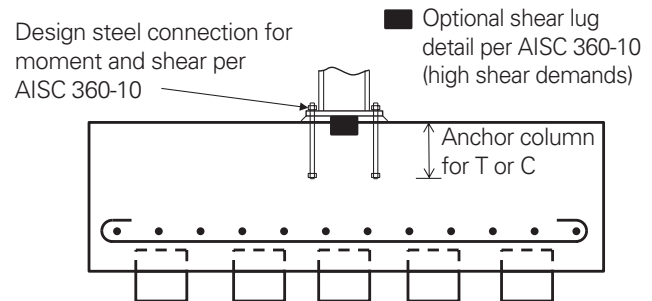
Typical steel column-to-pile cap connection detail (high shear demand).
